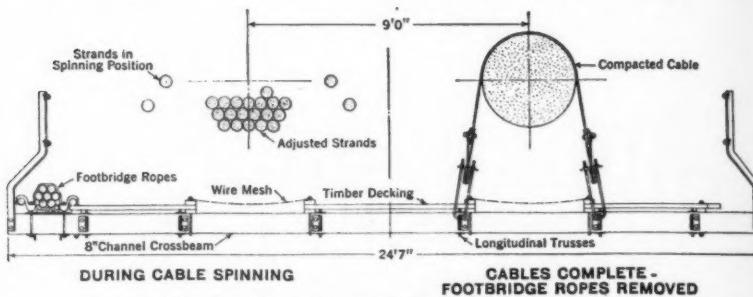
CROSS-SECTION OF MAIN SPAN FOOTBRIDGE.
